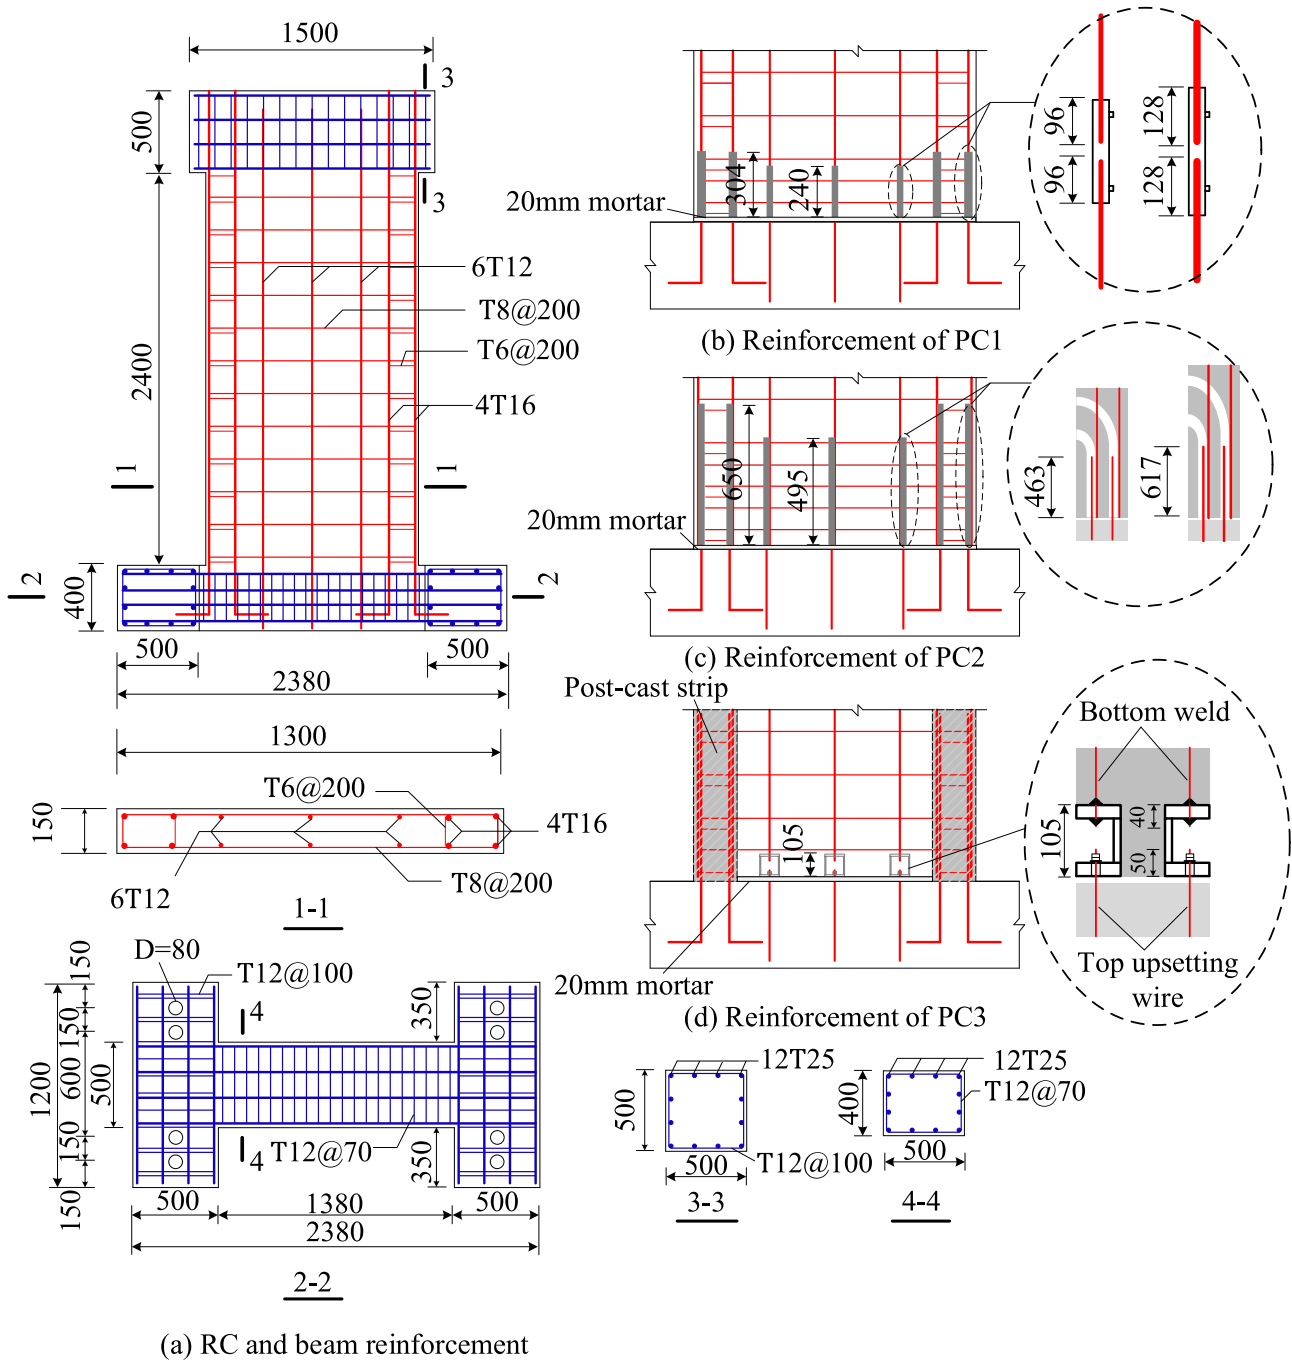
Dimensions and reinforcement layouts of specimens (unit: mm).
